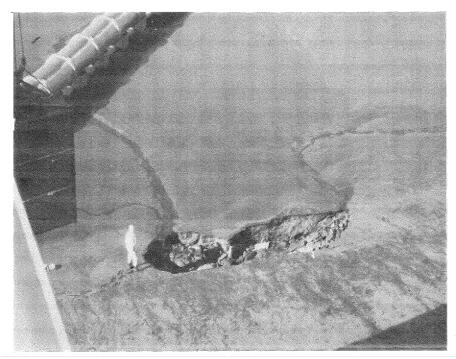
Asphaltic paving and compacted earth lining adjacent to subsurface drainage inspection chamber, December 15, 1963.
